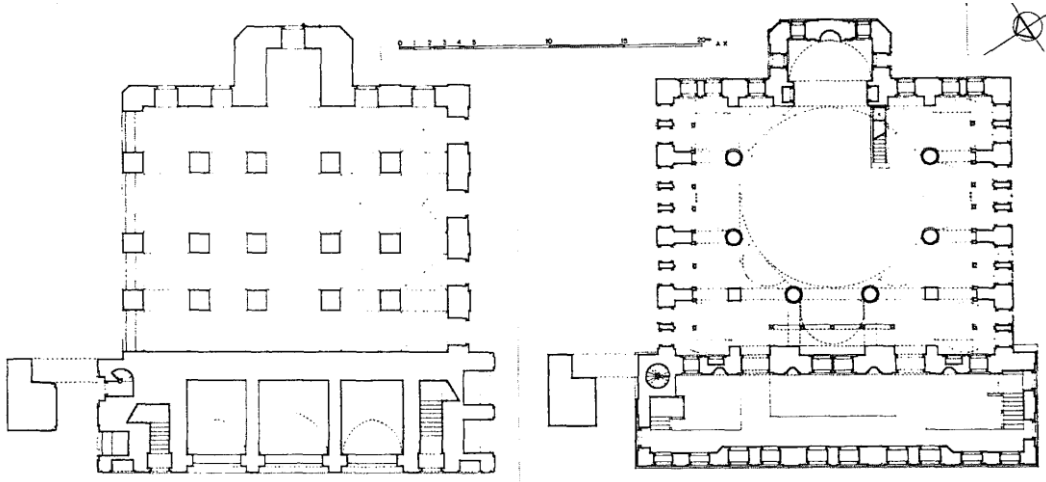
AzapKapı, Sokullu Mehmet Pasha Mosque basement and ground floor plans (Kuran, 1996).
